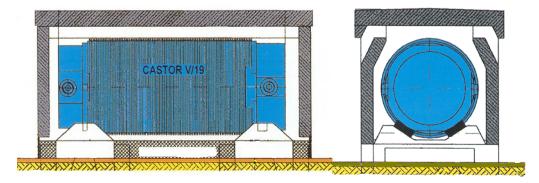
, Cross Section of a Concrete Garage around a Transport and Storage Cask
